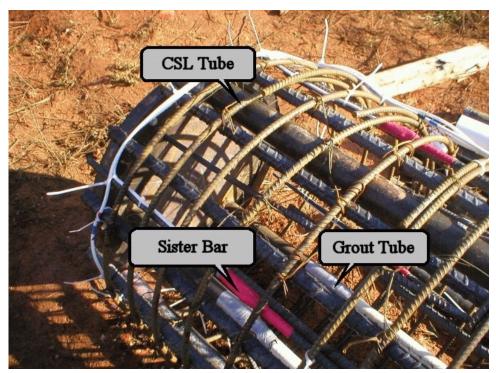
Detail View of Sister Bars, CSL Tubes, and Grout Tubes
